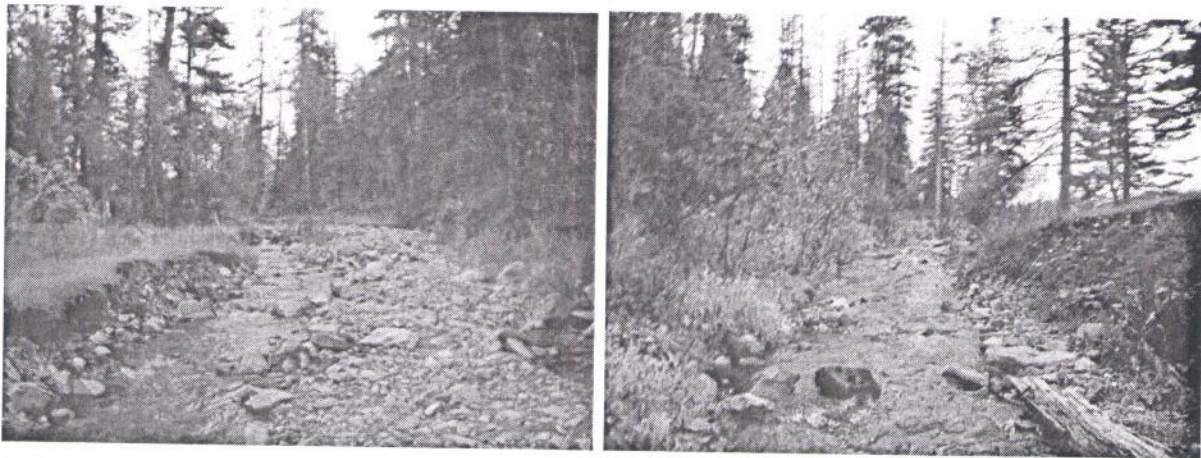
AND 10: Last culvert on Cabresto Creek (left) and looking upstream from the last culvert on Cabresto Creek (right).
